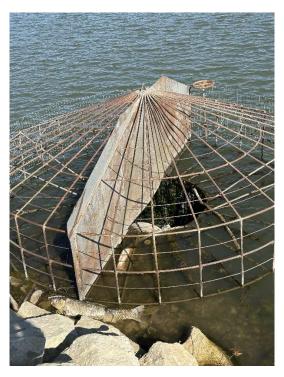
Primary spillway intake, CMP riser with trash rack and vortex plate.
